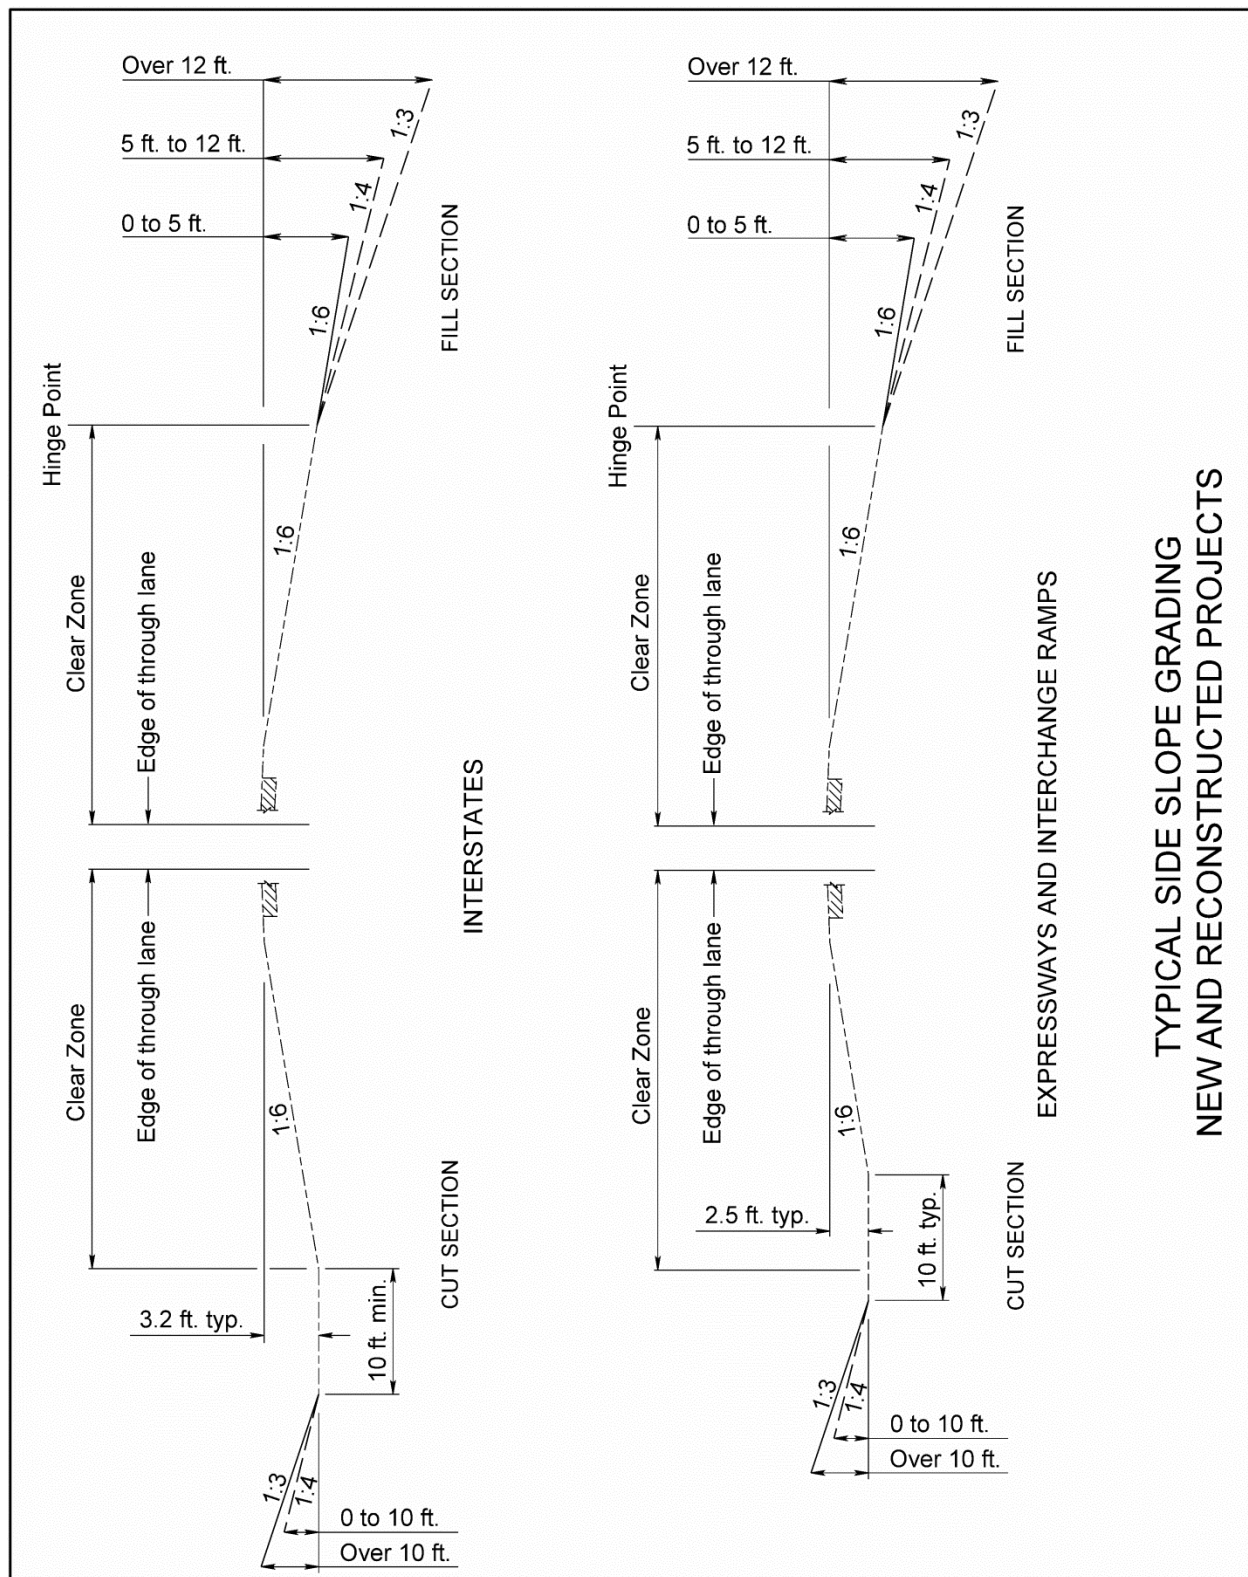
Typical Side Slopes for New and Reconstructed Projects
